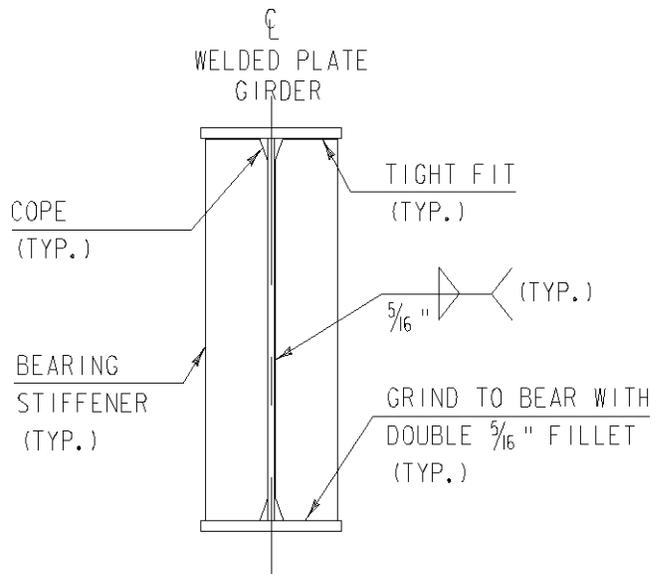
4 Pier bearing stiffeners for welded plate girders
